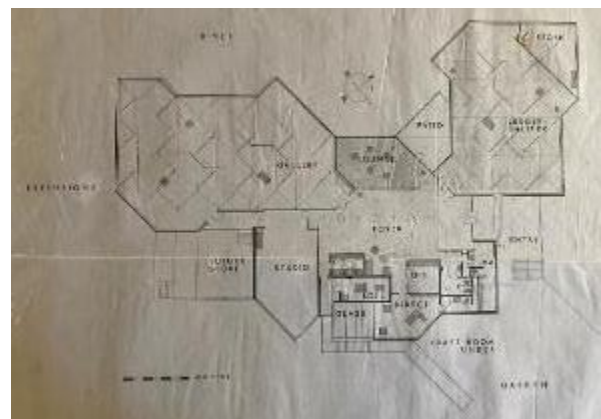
c. 1972-3 floor plan, showing reduced Gallery One, and provisions for 'Future Store' and Extensions to the west. Note public entry and staff entry arrangements have been altered from original floor plan. Source: State Library of Victoria.
